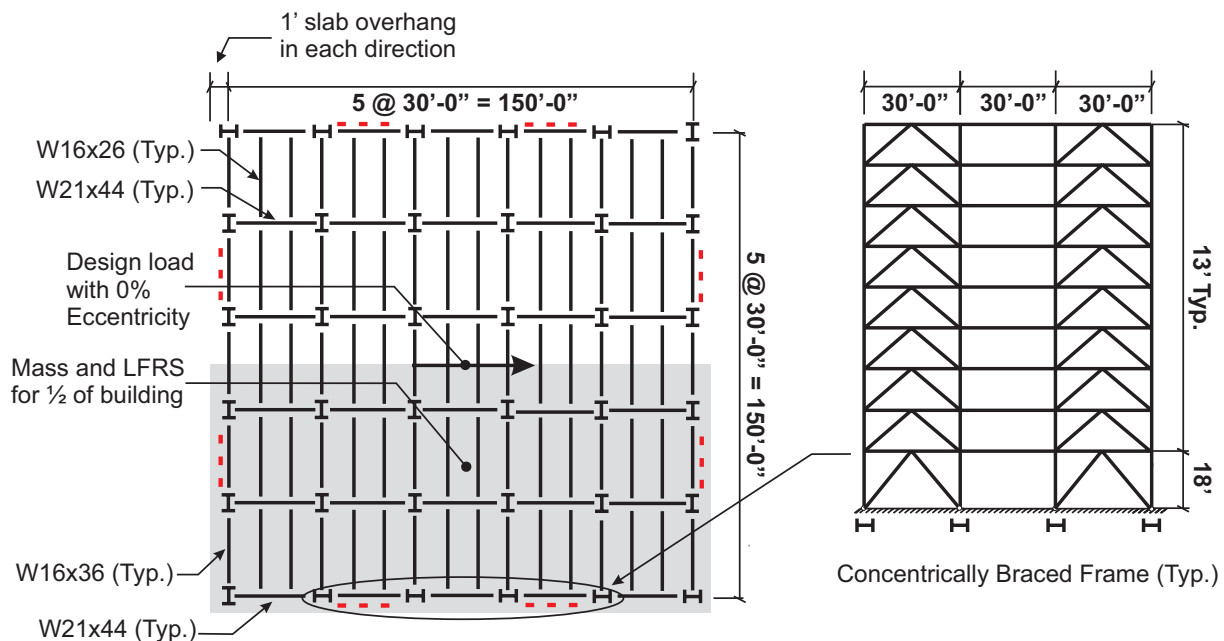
R3 Plan view and 9-story braced frame elevation.
